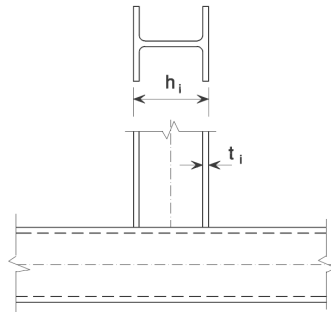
Welded joint connecting an H section to a RHS member [49]
